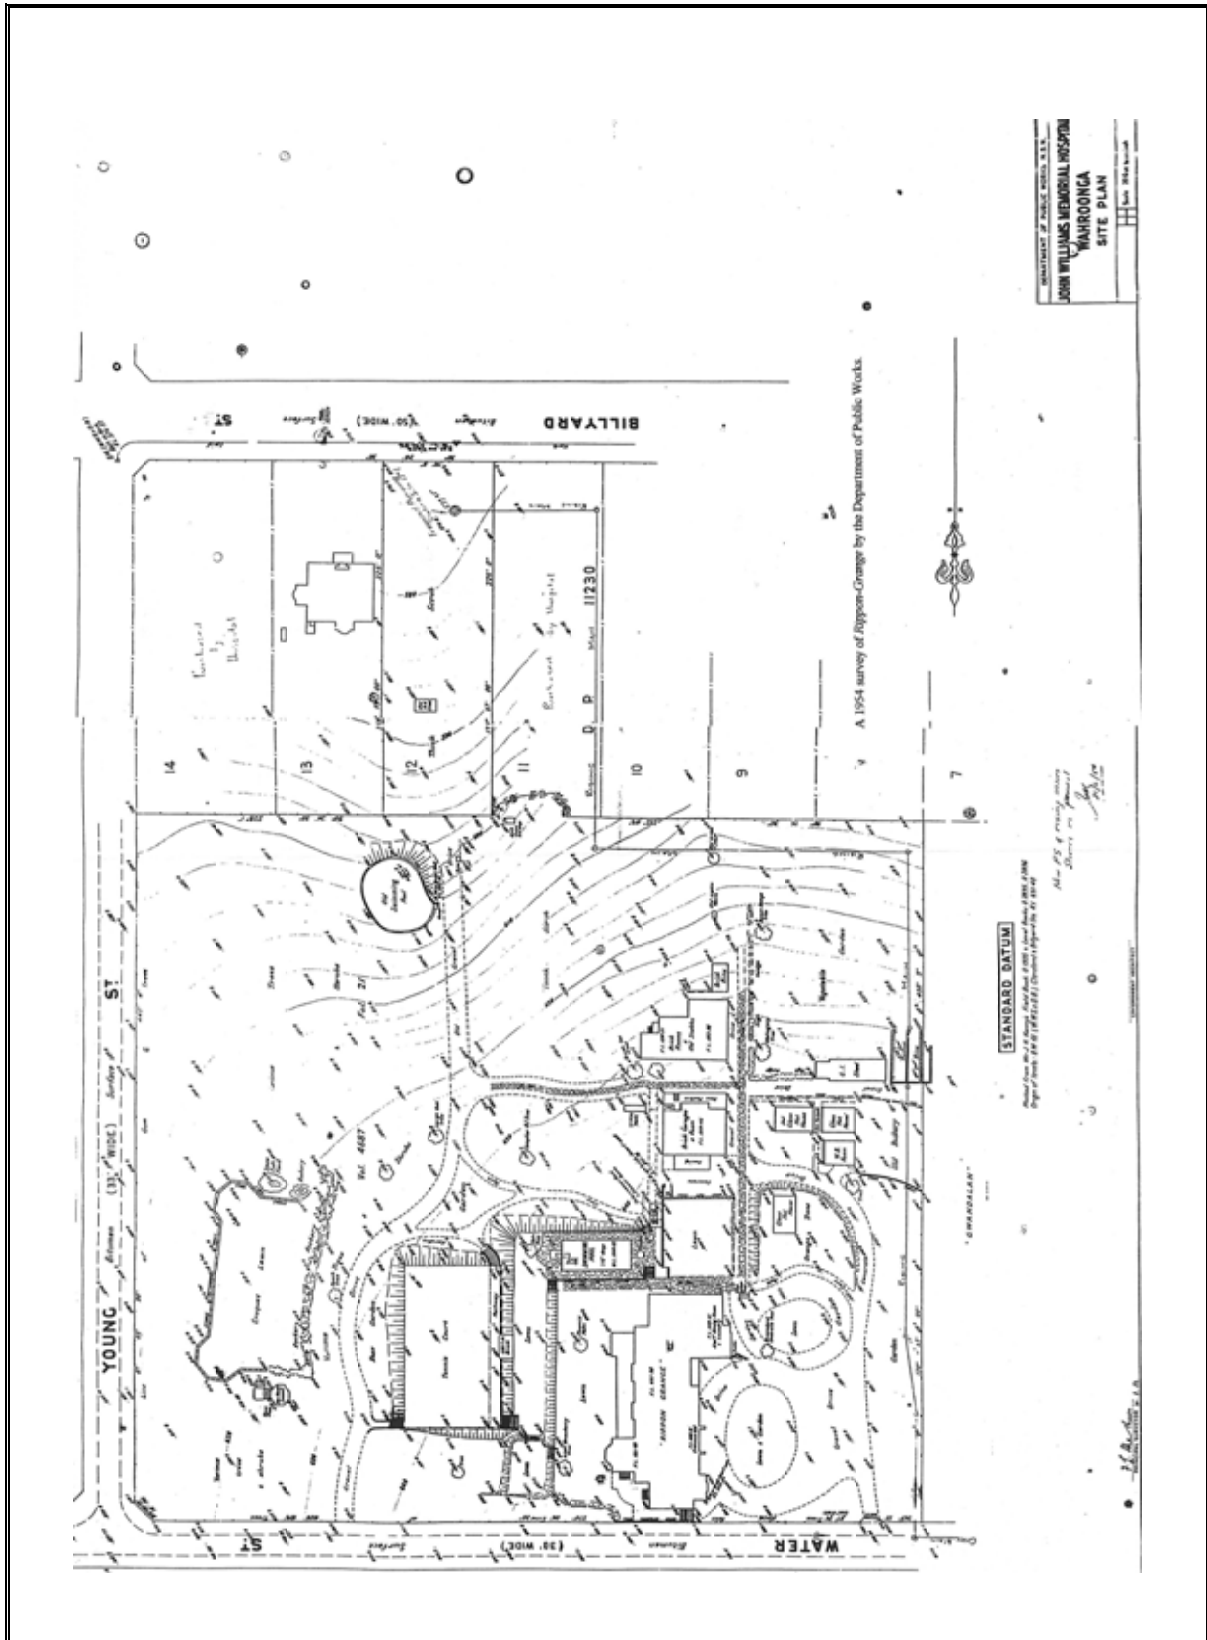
A Site Survey made by the Department of Public Works N.S.W., 1954 (Department of Public Works and Services Plan Room).
